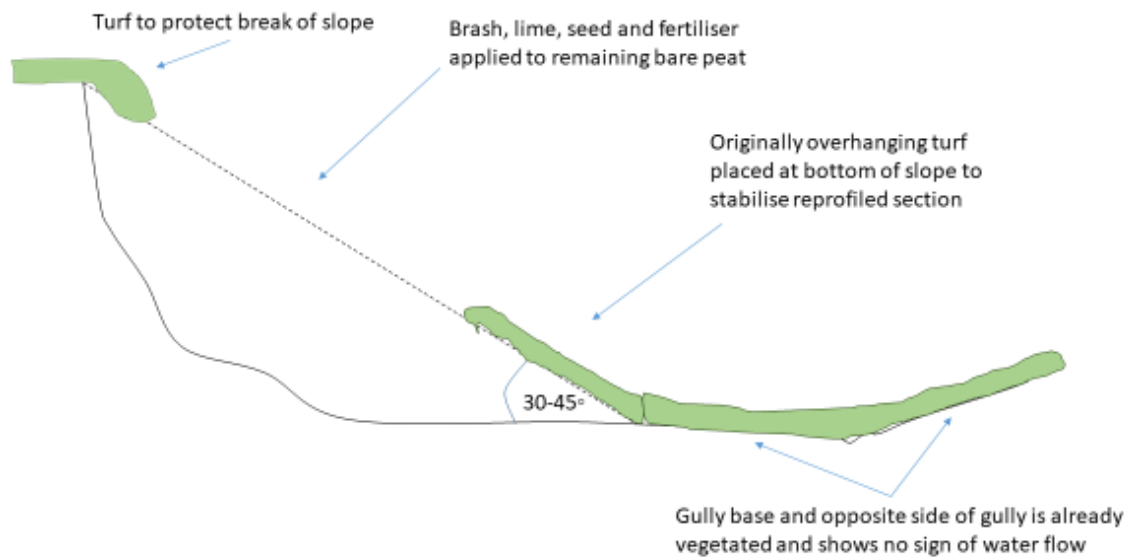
After reprofiling - not enough turf to stretch across entire slope
